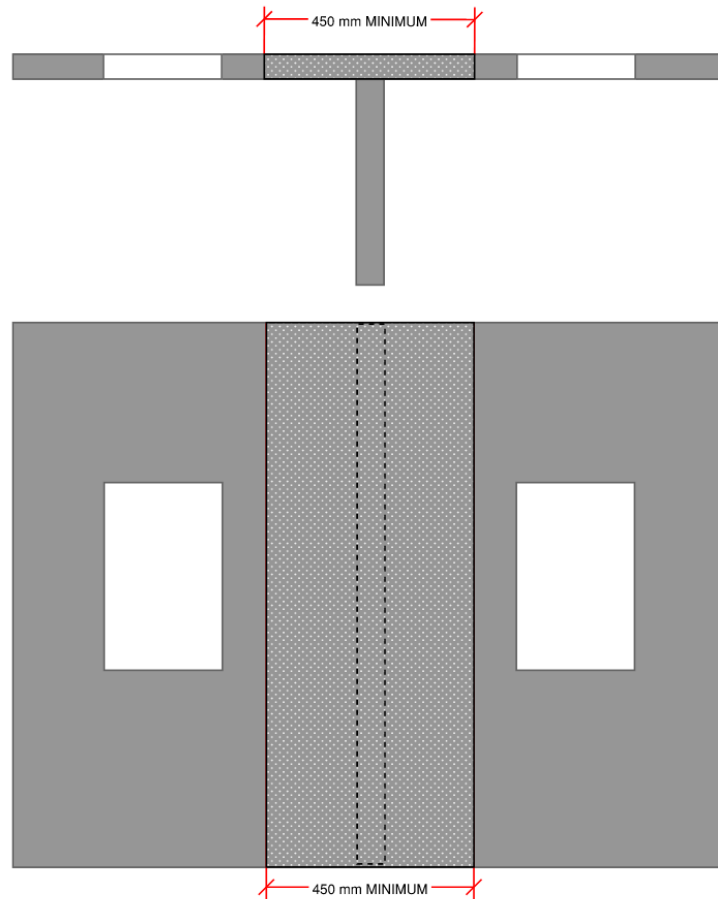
Plan view (top) and elevation view (bottom) of horizontal configuration cladding removal
